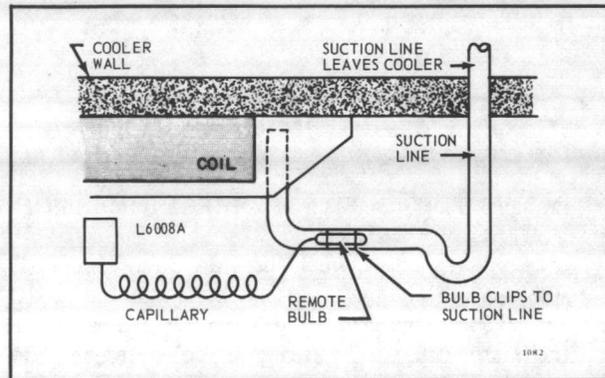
ATTACHING REMOTE BULB TO HORIZONTAL SUCTION LINE.
